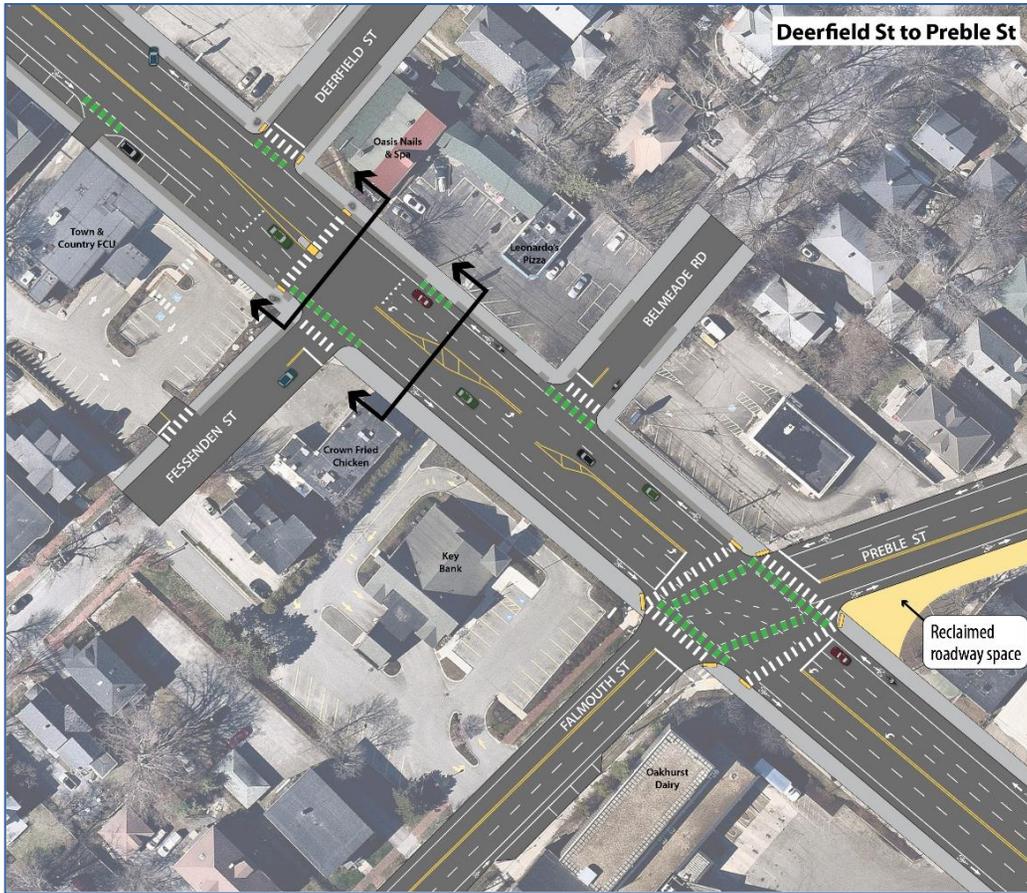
Alternative 1 – Forest Avenue from Deerfield Road to Preble Street
